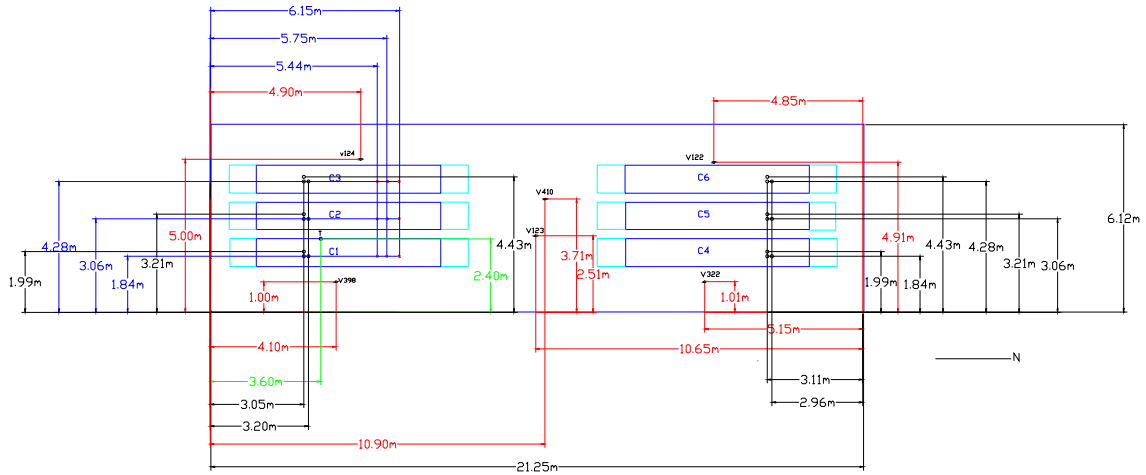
Plan view showing the locations of various instrumentation in test section.
